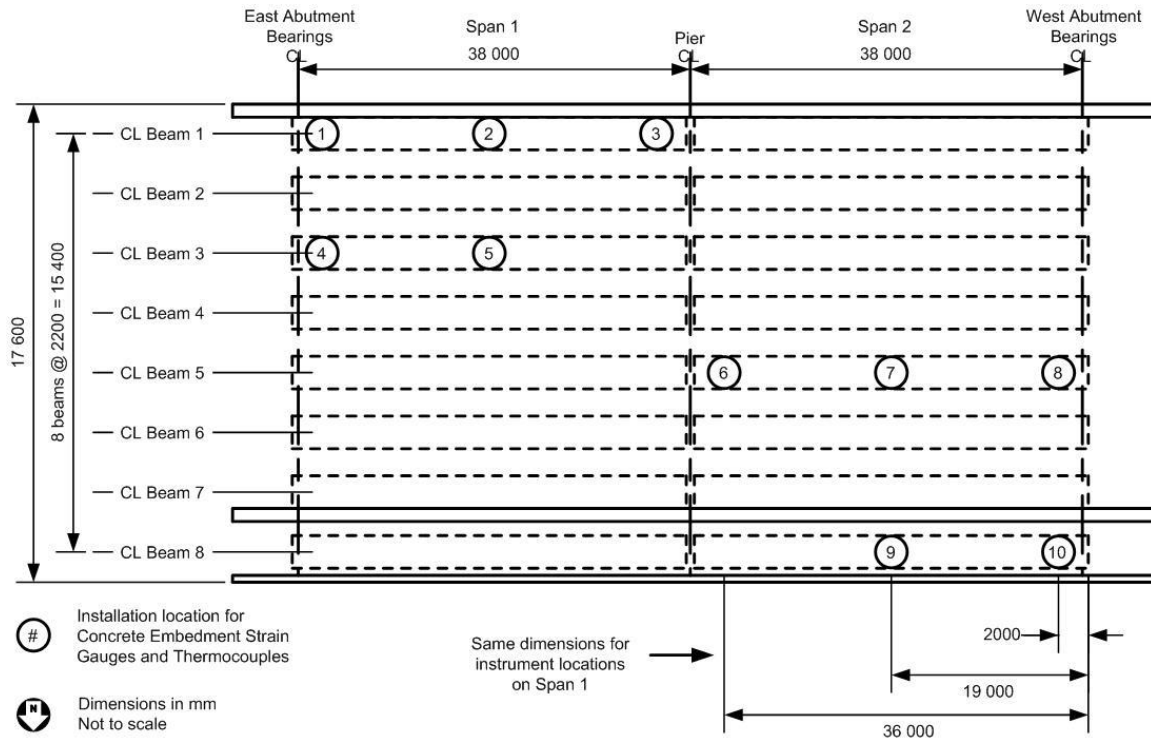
Instrumentation locations for the concrete strain gauges are denoted from 1-10.
